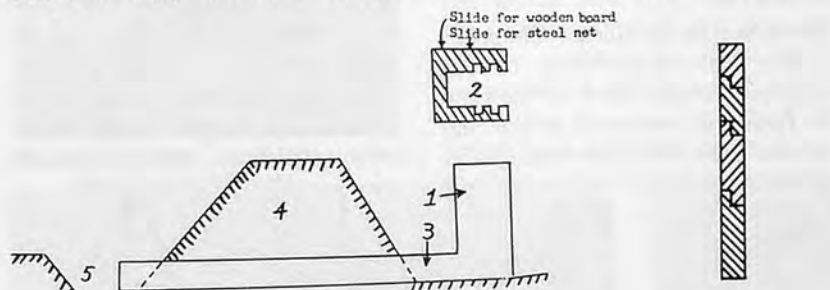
1. Concrete Lock, 2. View on to Top of Lock, 3. Concrete Pipe, 4. Embankment, 5. Water Channel Fig.2 Wooden Lock Boards
